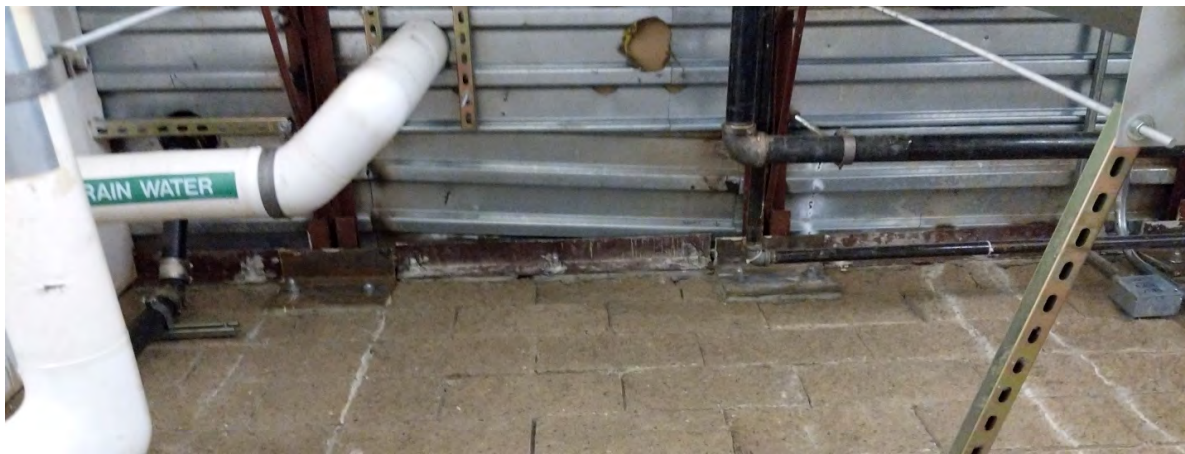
Roof joist to CMU wall connection, located in the Boiler Room.
